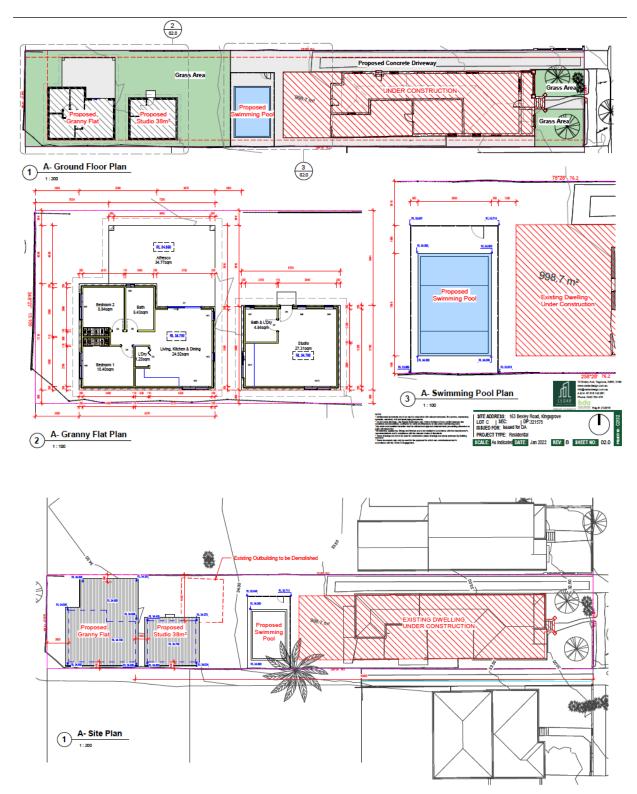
Proposed Site Plan for the demolition of the existing Outbuilding structures and the construction of a Secondary dwelling, Outbuilding, and Swimming pool Source: Cedar Design & Construct
